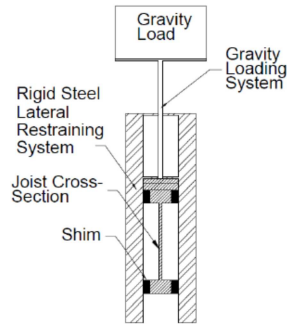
Schematic of test fixture used to minimize warping of cross section under load
